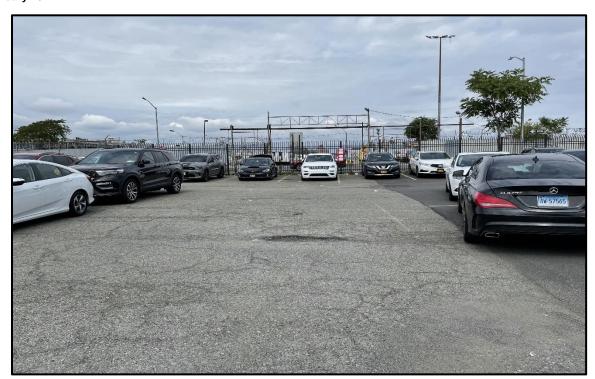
Facing north in the northern portion of the site; pothole observed in the employee parking lot.
